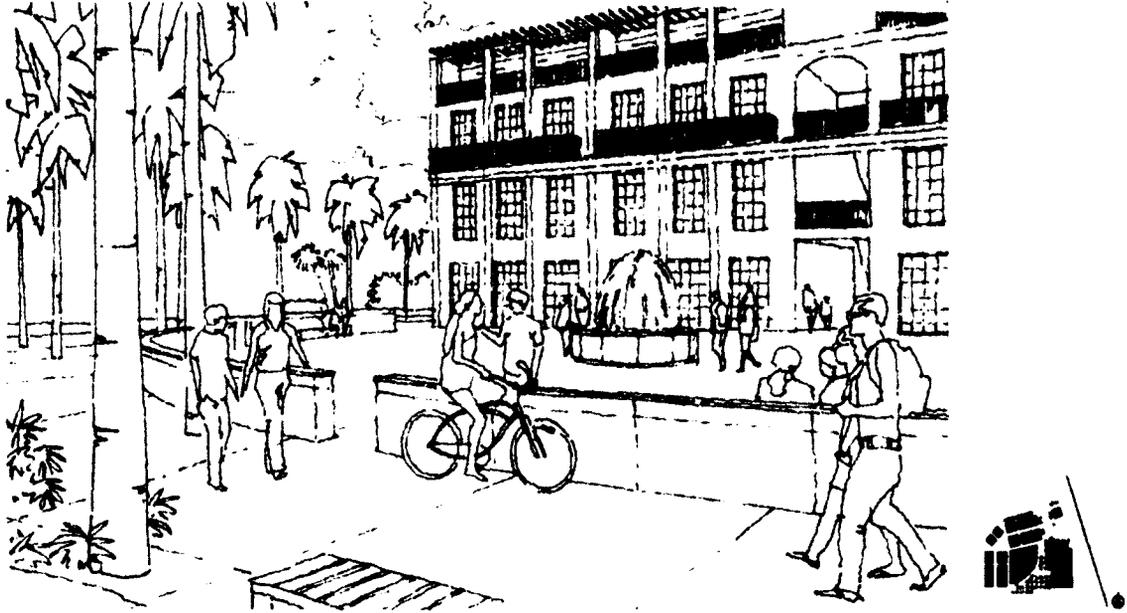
Perspective showing central square looking at the south-west corner. (Image by Author)
